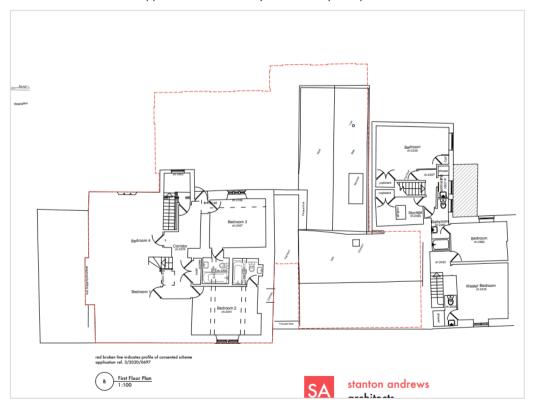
Existing first floor layout – the red dotted line indicates the footprint of the extension granted consent in 2017 as previously mentioned.
